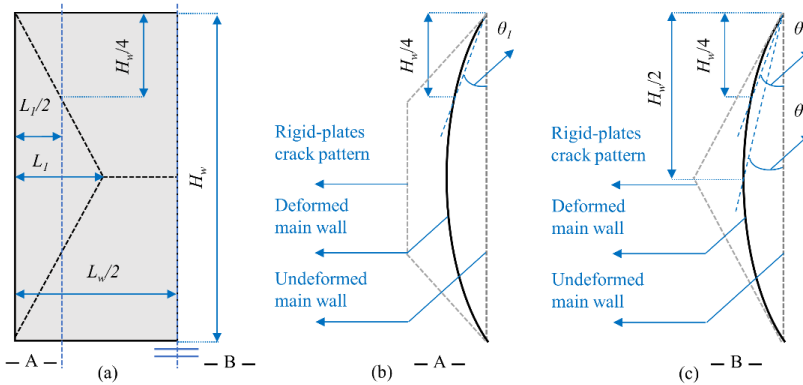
Determination of the completion of rigid-plates crack pattern: (a) idealised rigid-plates crack pattern shown with the left symmetric part; (b) deformed shape of the wall at section A; (c) deformed shape of the wall at section B (mid-span).
